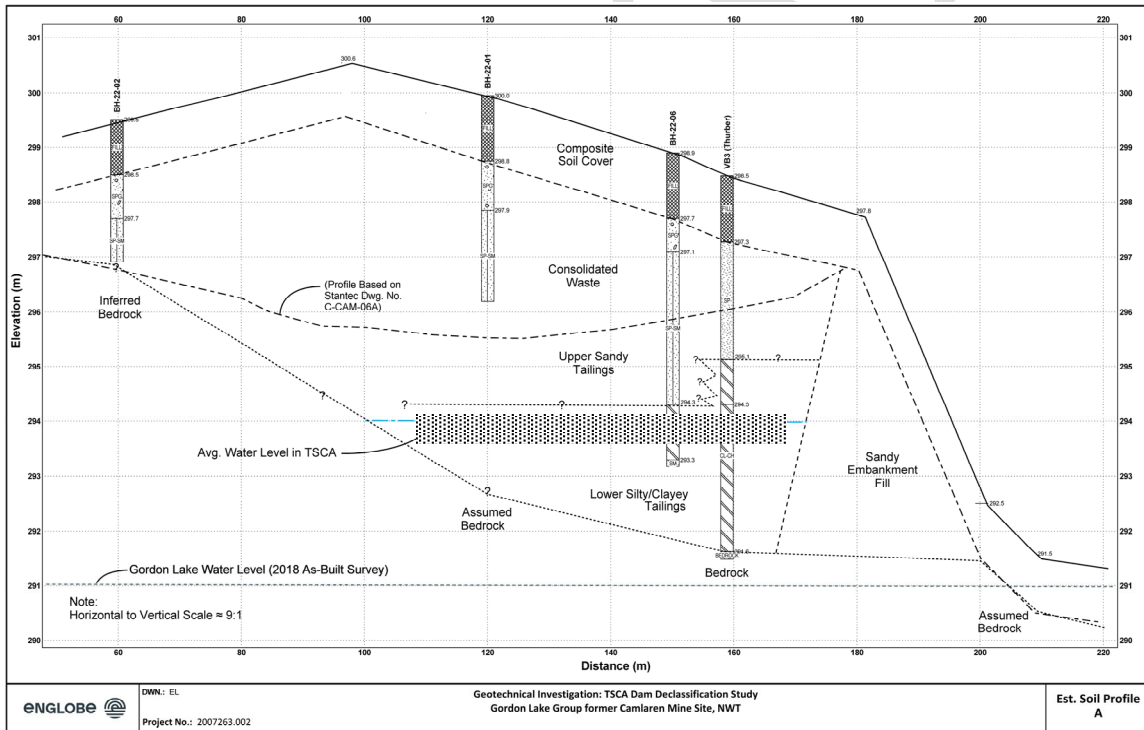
Cross Section View Showing Cross Section A Boring Locations and the Potential Liquefiable Zone Based on Robertson 2021
